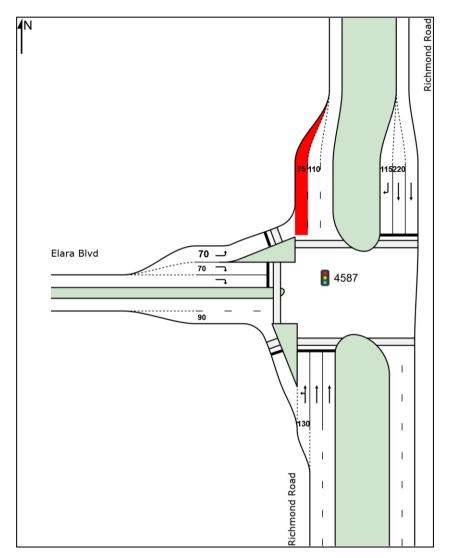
2018 Base layout of Richmond Road / Elara Boulevard intersection
